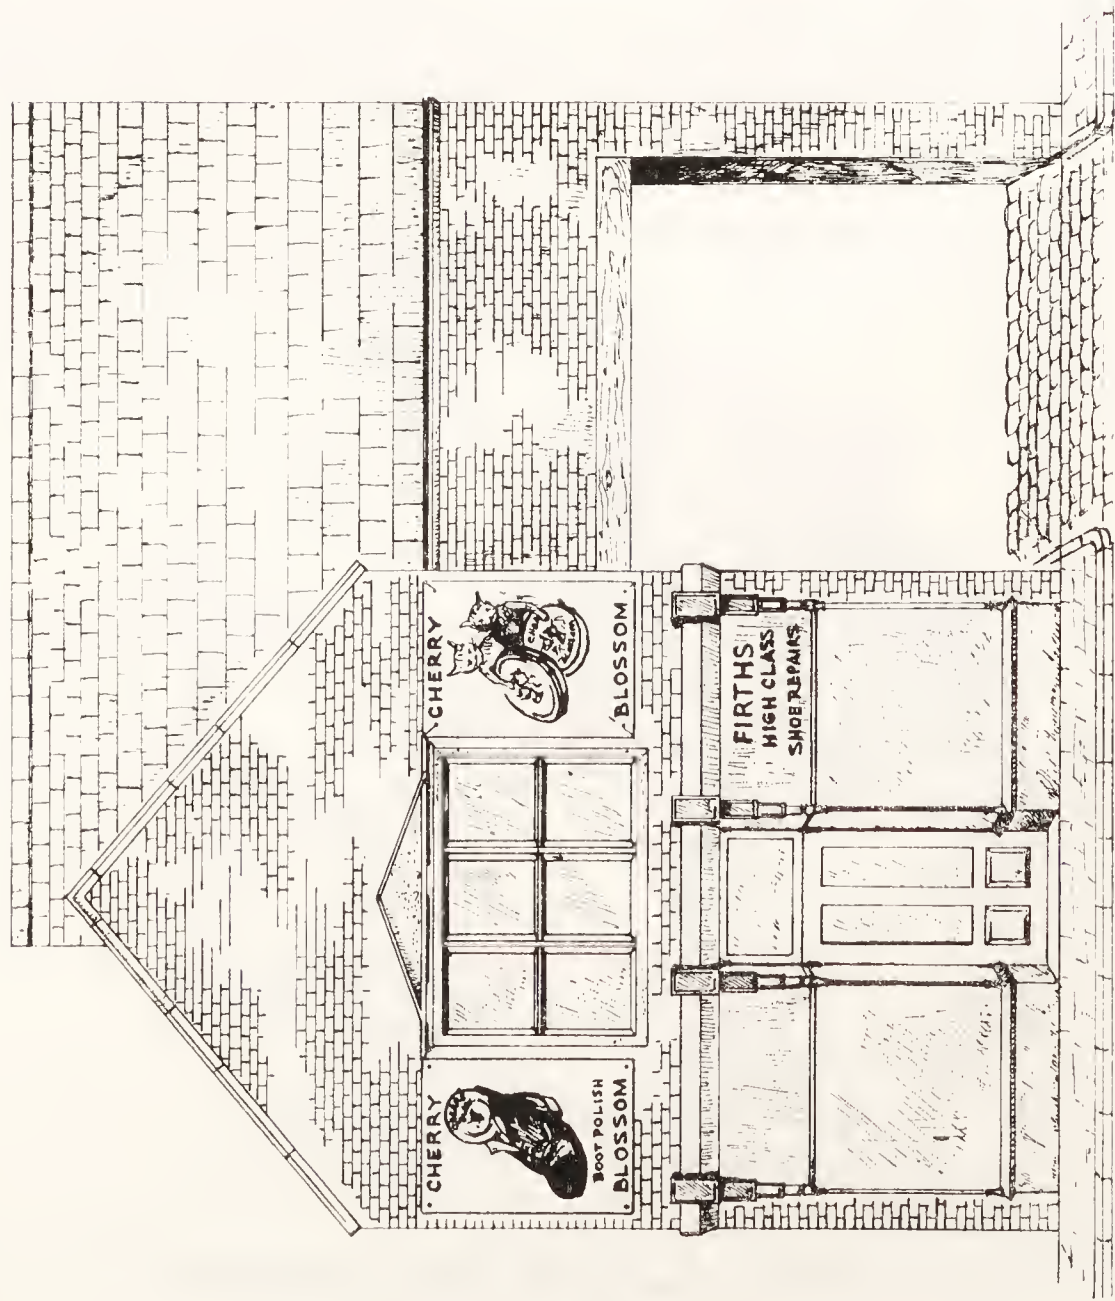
John Bunny's House, Kirkgate (remaining with late façade).
